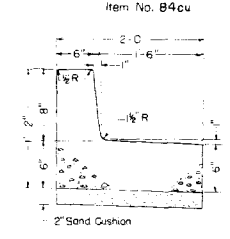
DETAIL OF MOUNTABLE TYPE CONCRETE COMBINATION CURB & GUTTER
